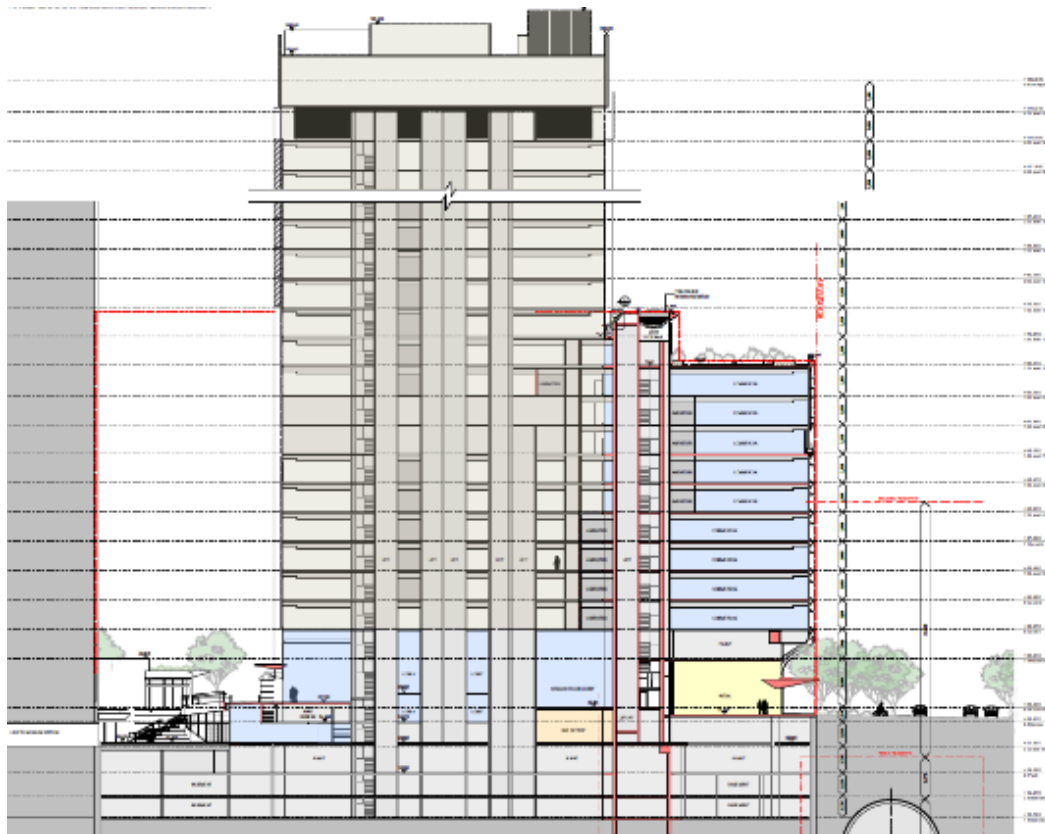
North-South Section. The dotted red outline shows the podium envelope approved under D/2017/349.
